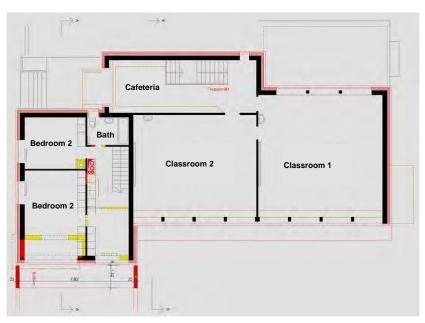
1st floor plan of school building with caretakers apartment (left). Red: new construction / building envelope, yellow: removed construction (source: Bruno Thoma)
